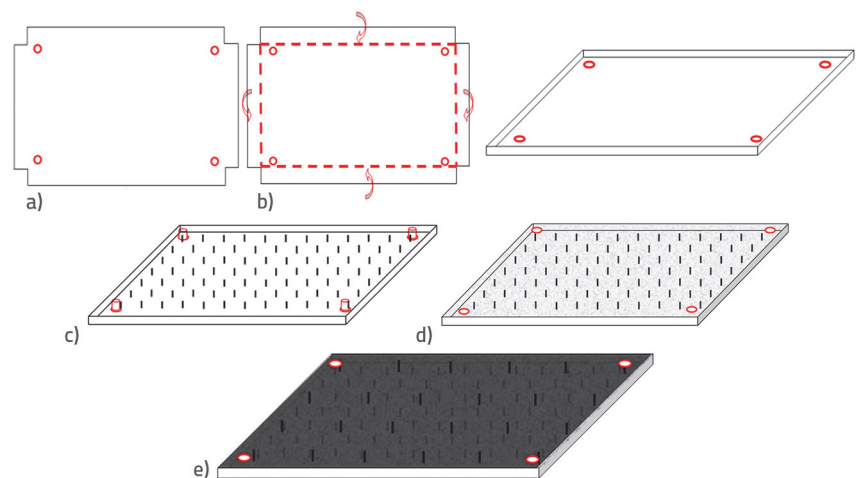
Production sequence sketch for the prefabricated composite panels: a) b) Bending of the specially shaped 2 mm thick steel plate; c) plate with welded shear studs and corners; d) placement of the concrete; e) Placement of the top plate with welded shear studs
